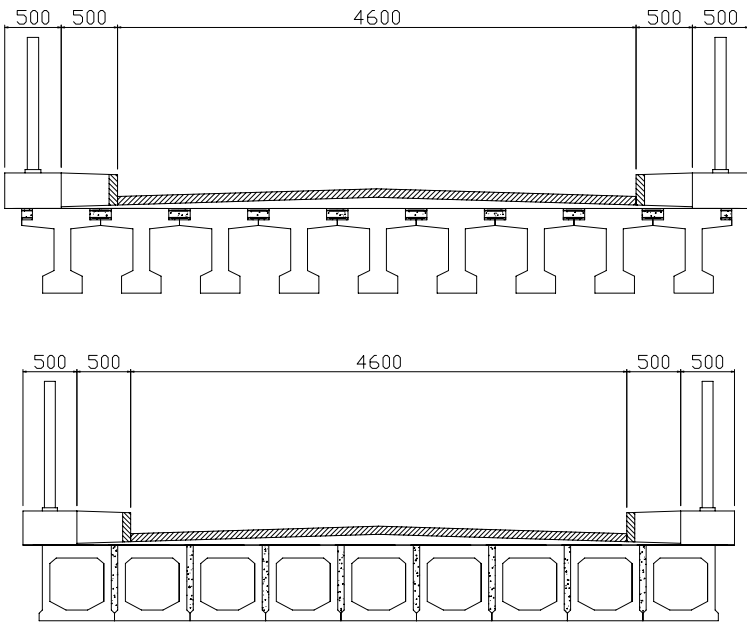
Typical one lane bridge of T-shape and box shape girders
